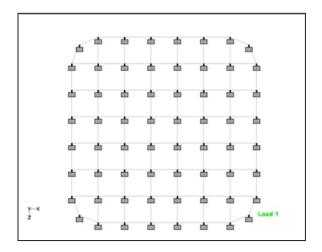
Top view of Square structures with rounded corners without shear walls.
